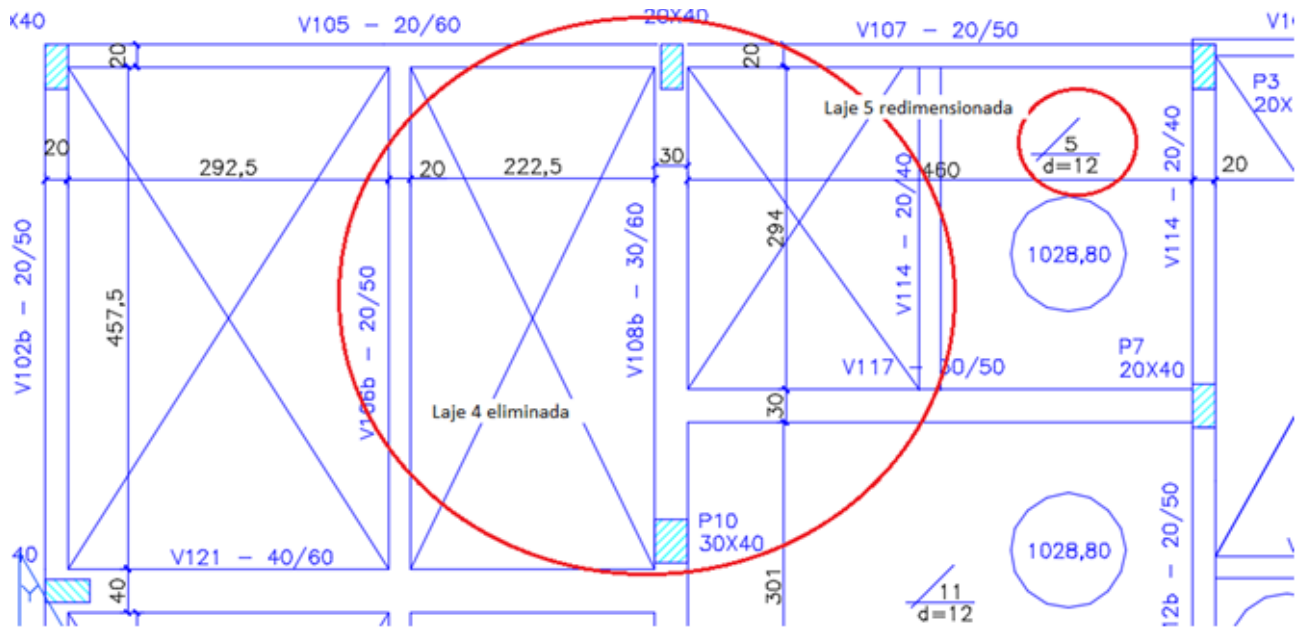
Slabs with sizing correction. Source – Construtora Collection, 2016
